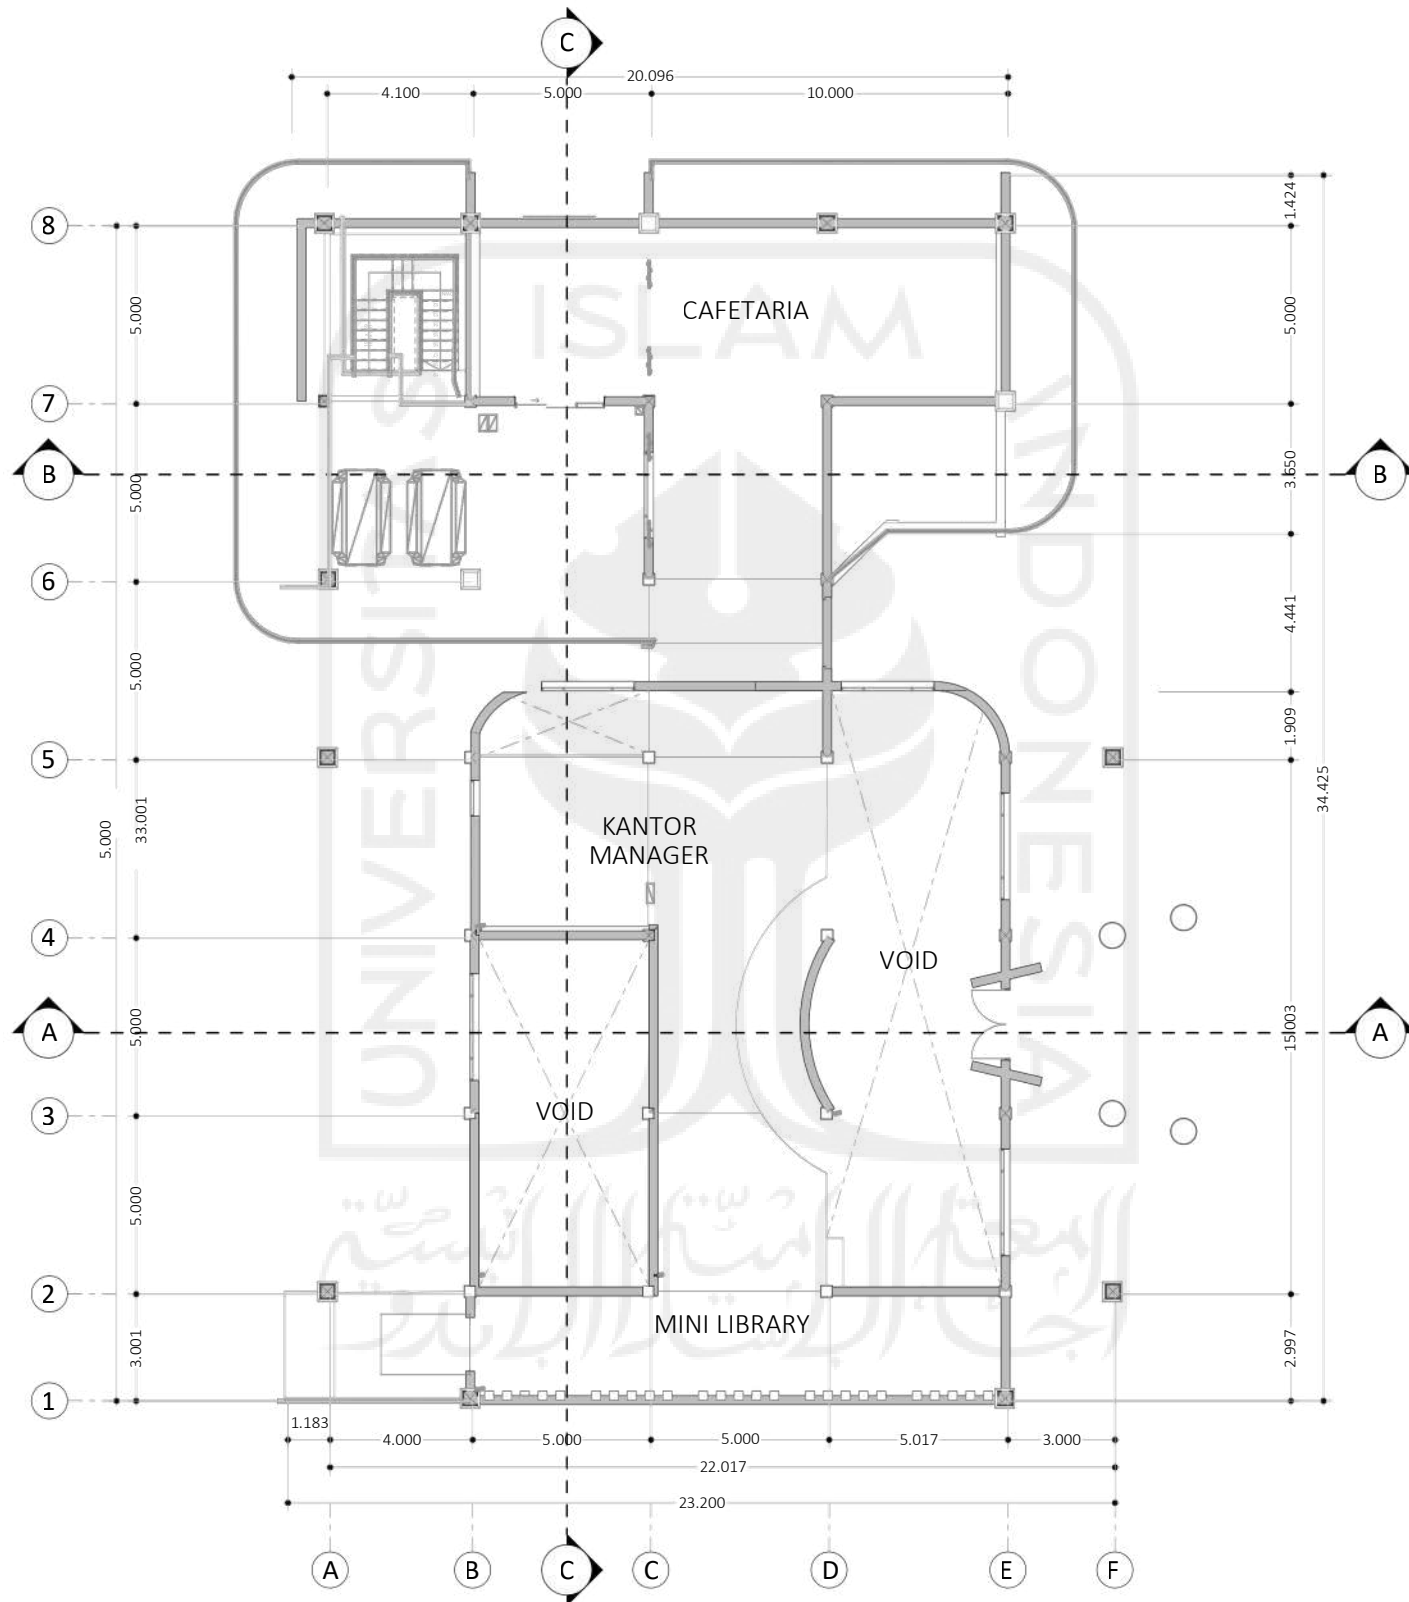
# DETAIL FLOOR PLATE 2ND FLOORS (BUILDING A1) AND DETAIL ROOF (BUILDING A1)
